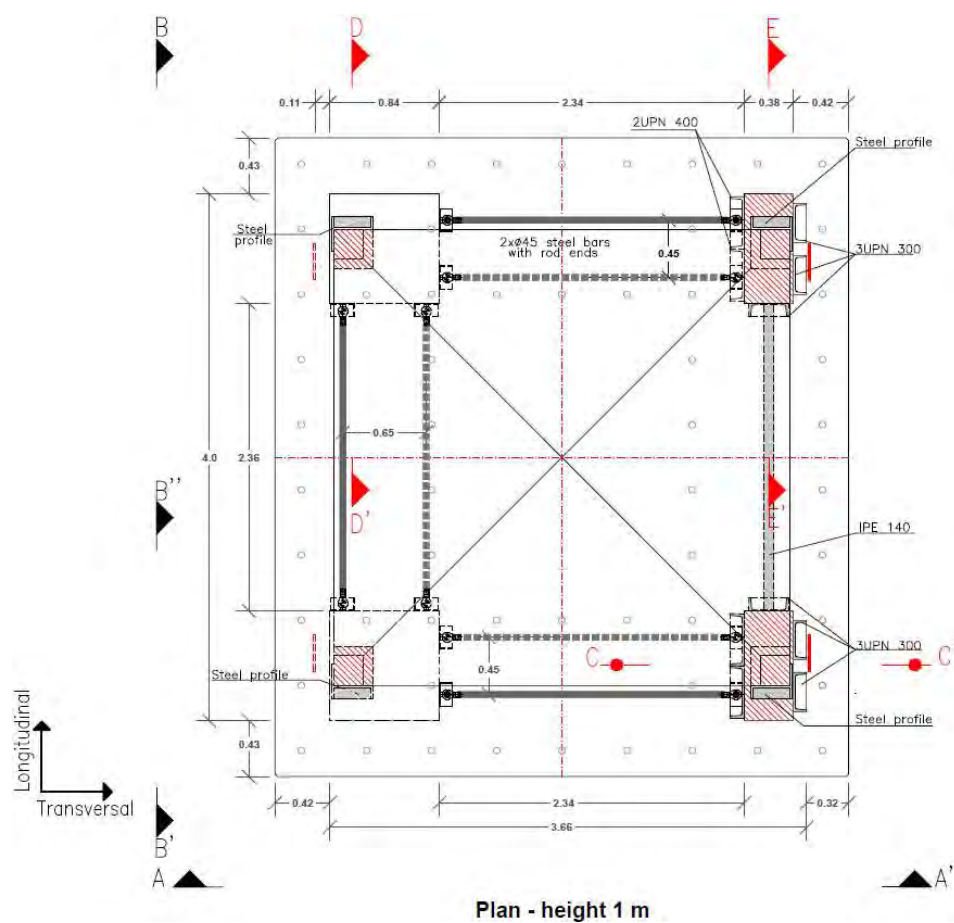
Plan view of the model (dimensions in meters). In red the elements made of masonry, in grey the elements made of steel
